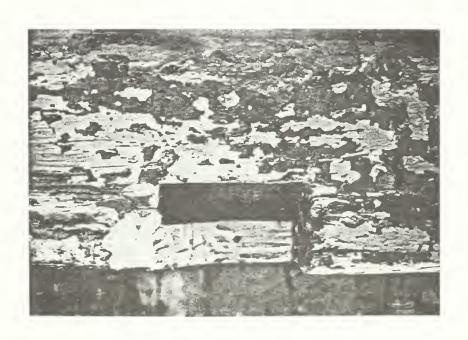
West India Goods Store, interior of second story, west wall looking west, post between bays A and B, showing cut made to accept partition framing.
